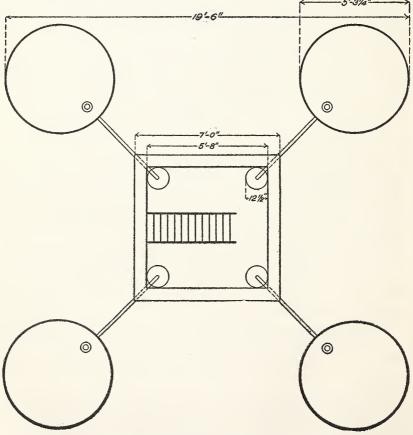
Tanks for soil investigation at Florida station-general plan.
